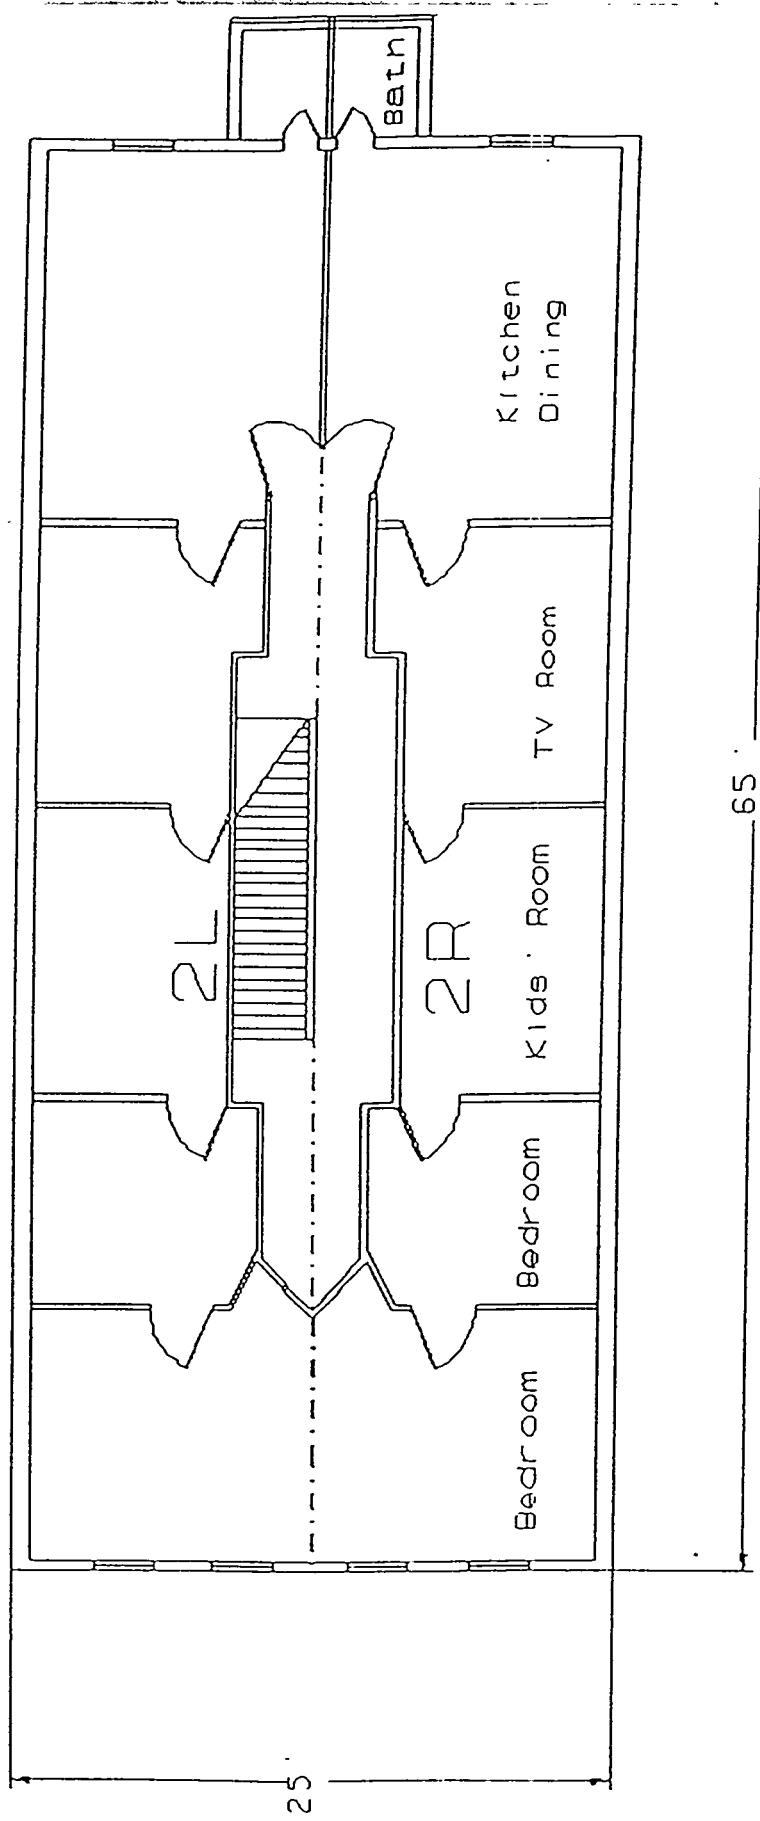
Typical Floor Plan at 347 Grove Street, Brooklyn, New York City
